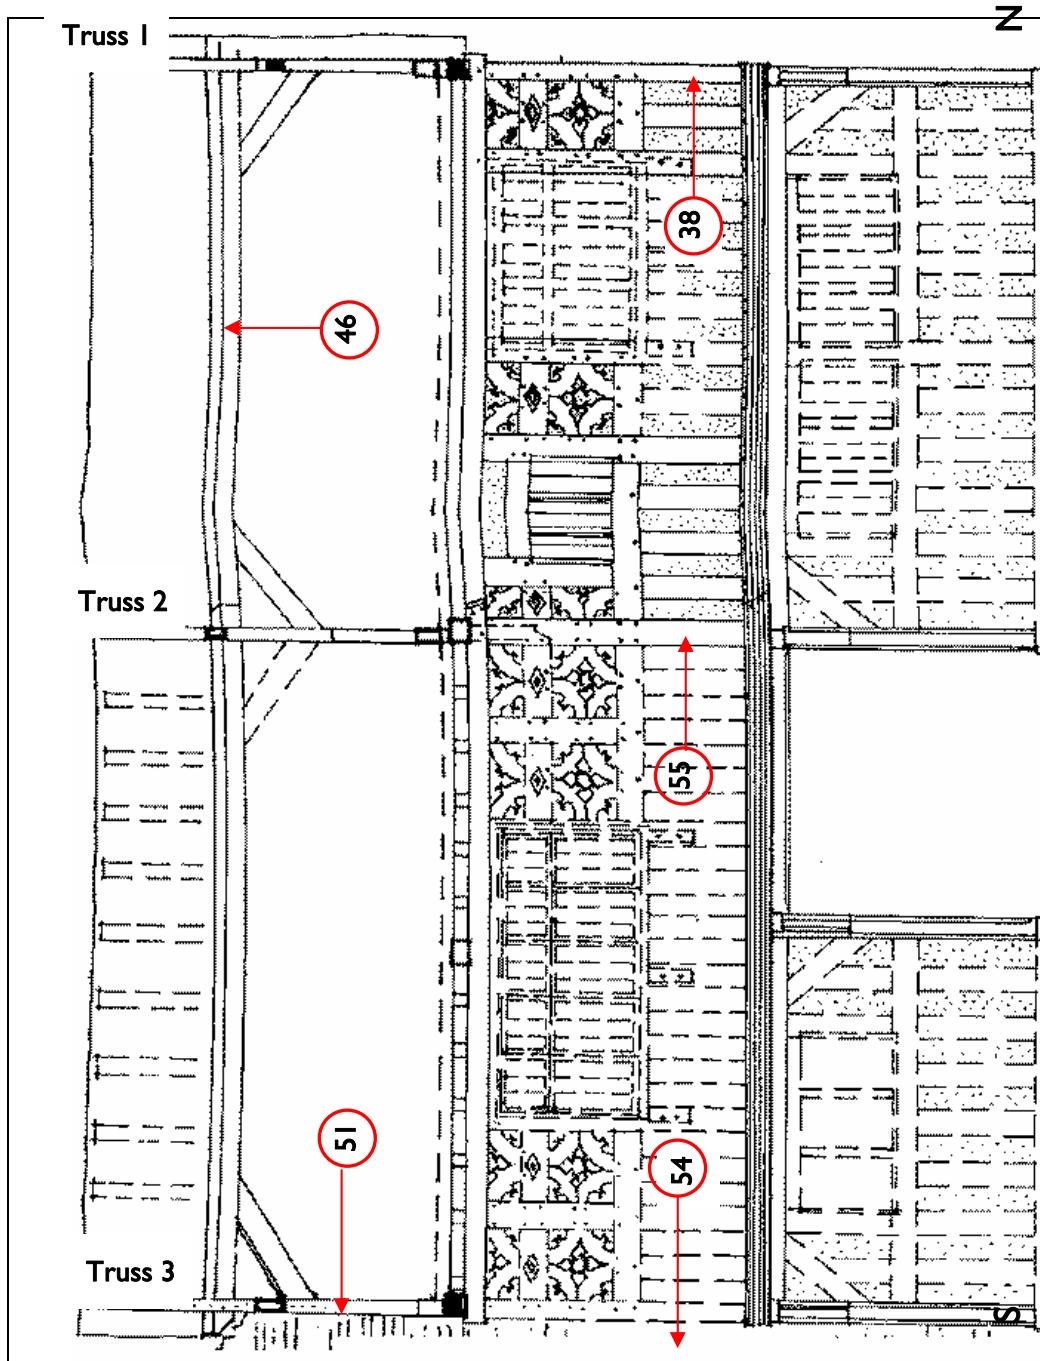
East elevation and section through roof of the gatehouse to show timbers sampled (after Jones 1975–76)
